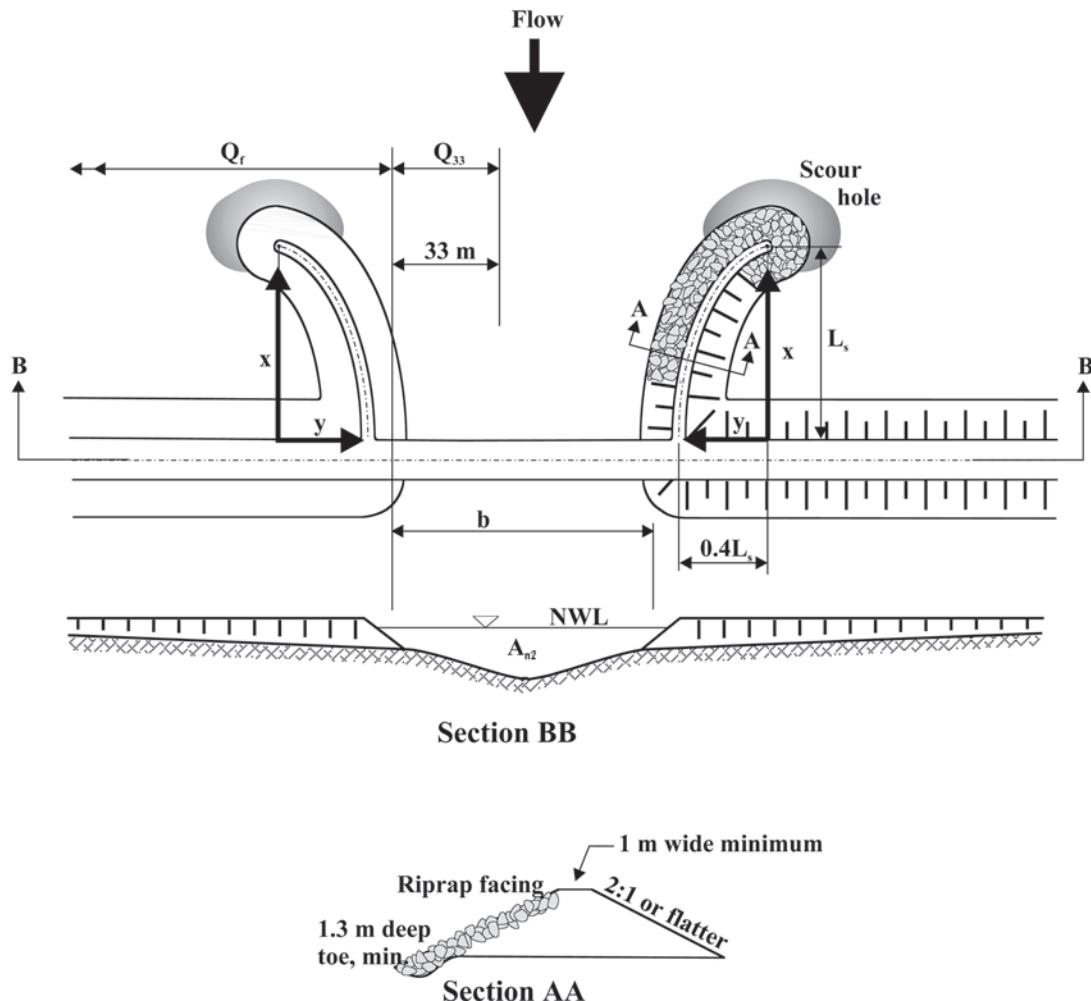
Typical guide bank details (modified from Lagasse et al. 1995).
